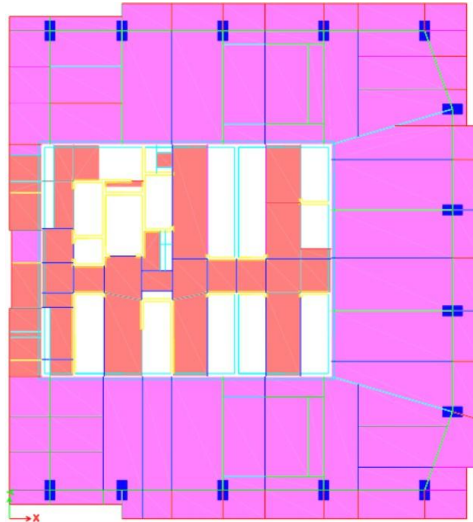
Typical Floor Plan for Floors 41-Roof Models 1, 2, and 3
